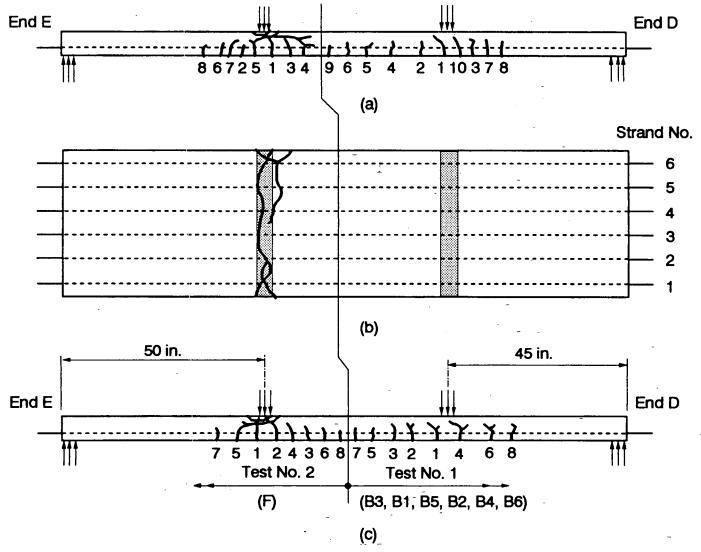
Crack patterns for D-type Specimen No. 16-6.0DU-3: (a) mirrored side view along Strand No. 6; (b) top view;
